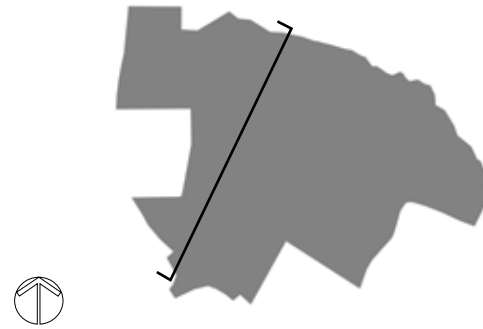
EXISTING TOPOGRAPHY PLAN (FABRIK, 2025)
